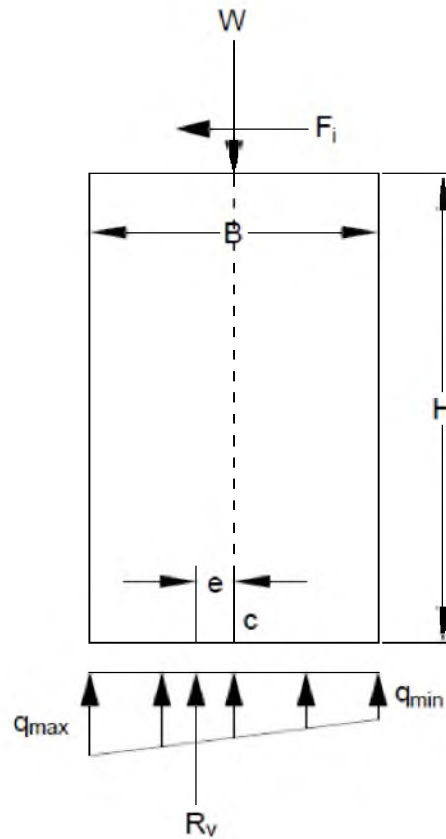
Cross-section of EPS embankment with forces acting on it
